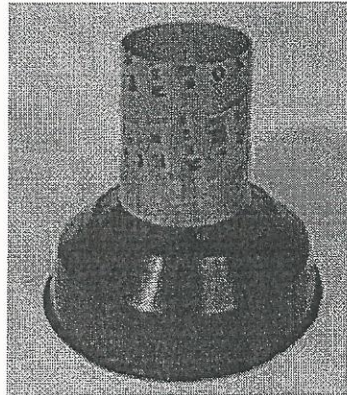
Redibase Construction Tube Footing Form with Pier Form Installed.
